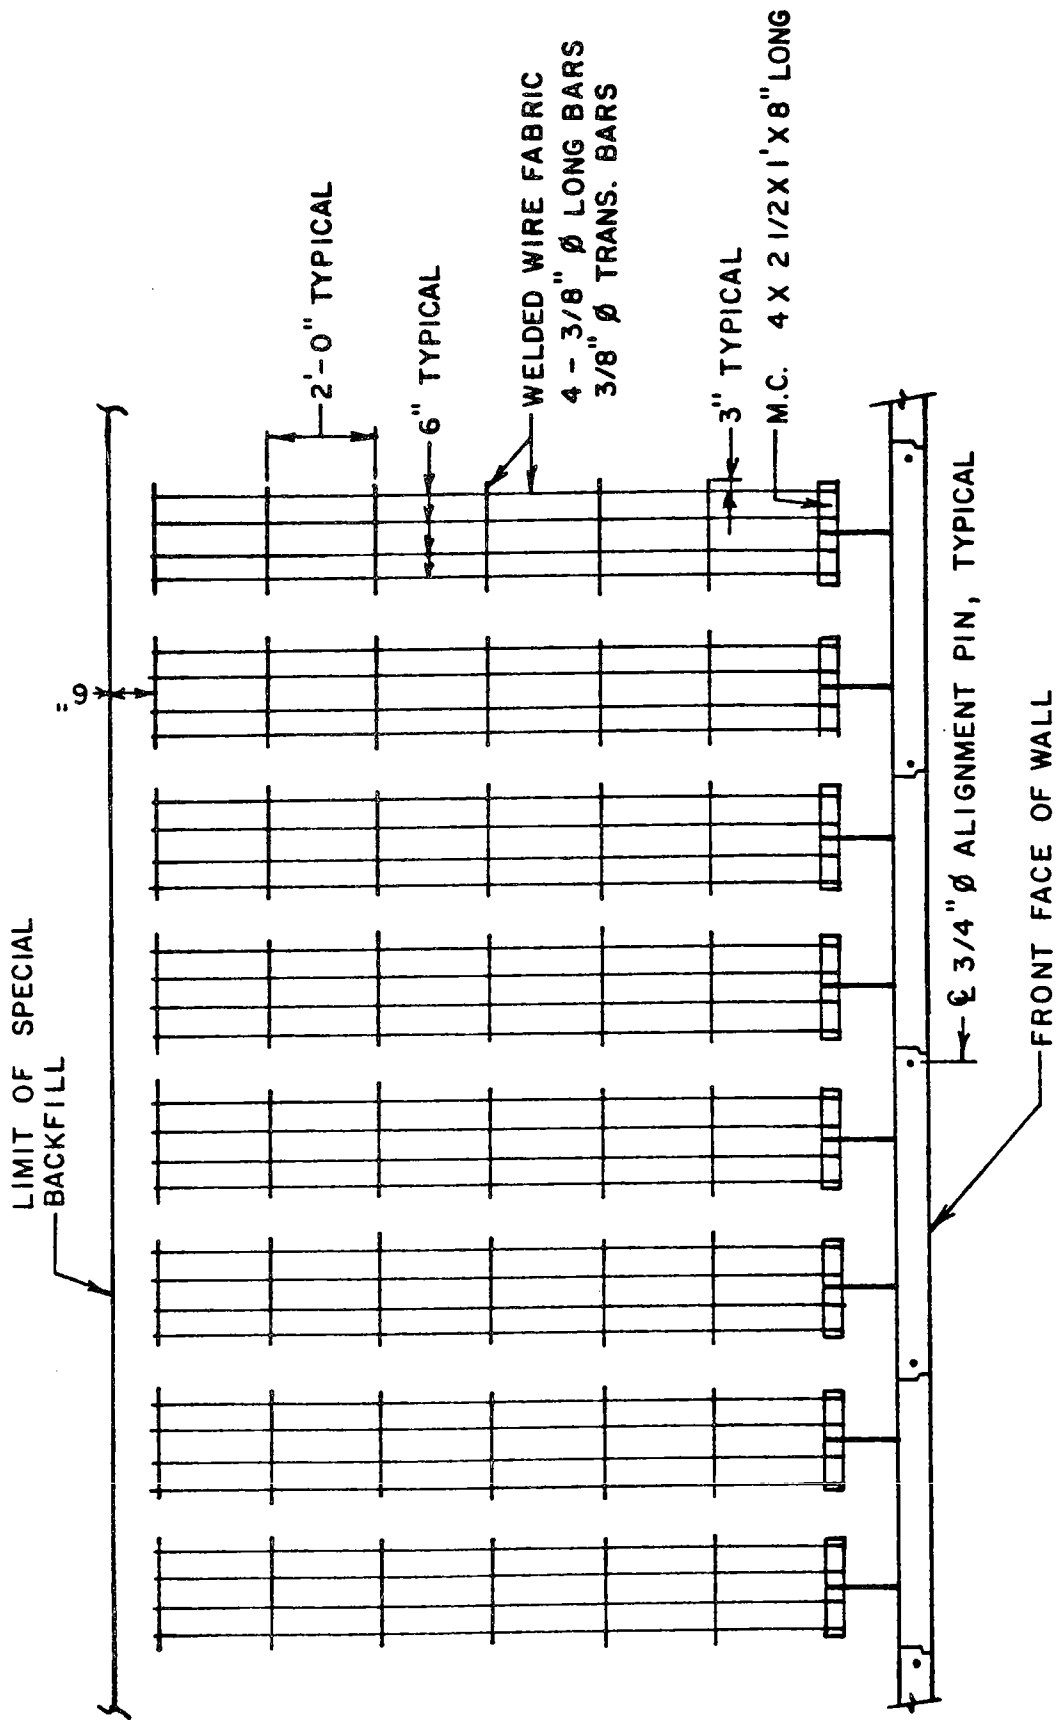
PLAN VIEW OF TYPICAL MAT ARRANGEMENT
